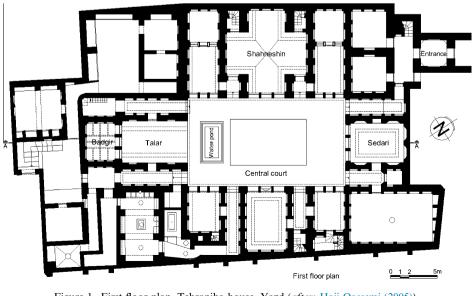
First floor plan, Tehraniha house, Yazd (after: Haji-Qassemi (2005)).
